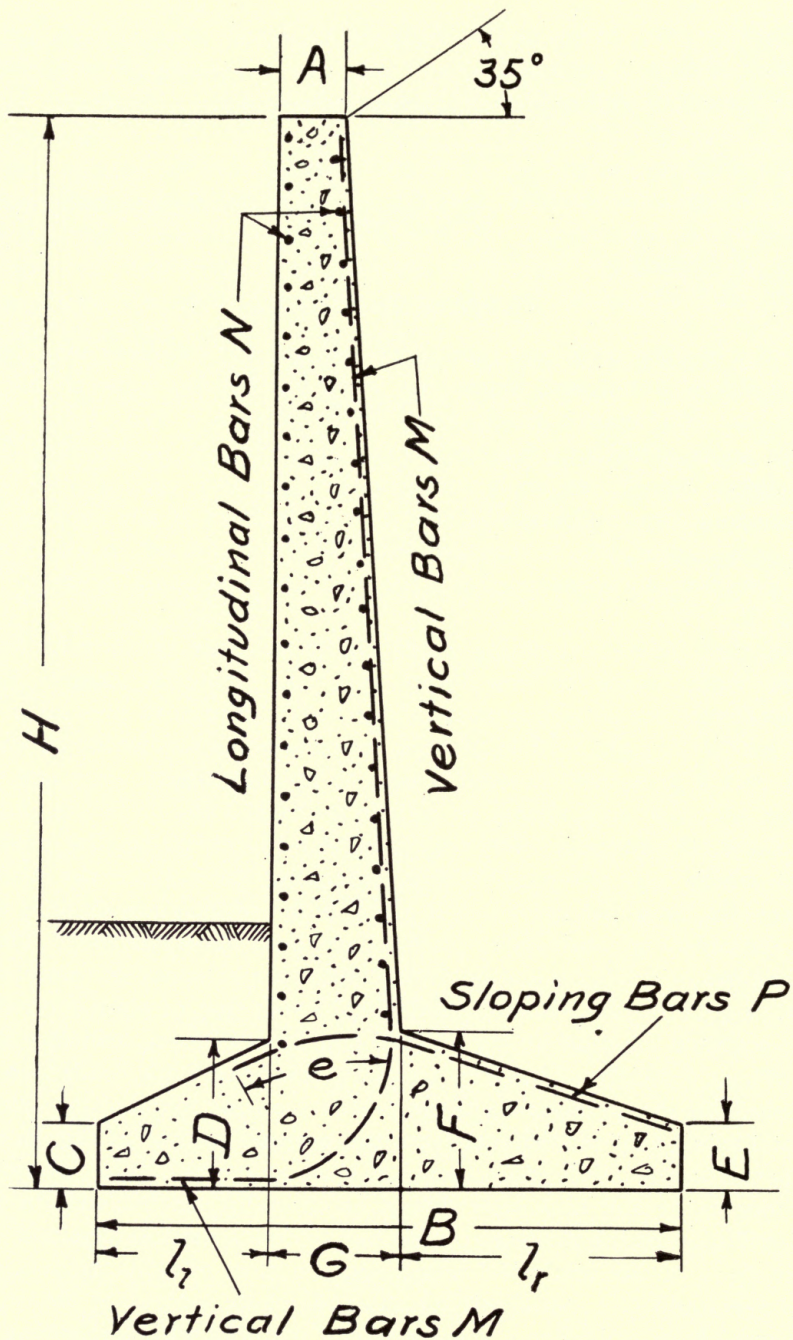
DESIGN OF T-SECTION RETAINING WALLS
